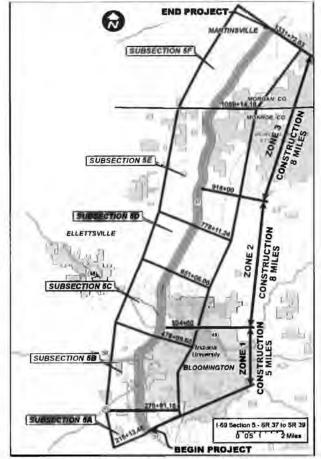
I-69 Section 5 Project Limits and Construction Zones.
